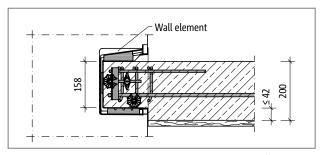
Schöck Tronsole® type Z: Wall element as stay-in-place formwork; underside of the landing lower than the connection frame of the wall element
